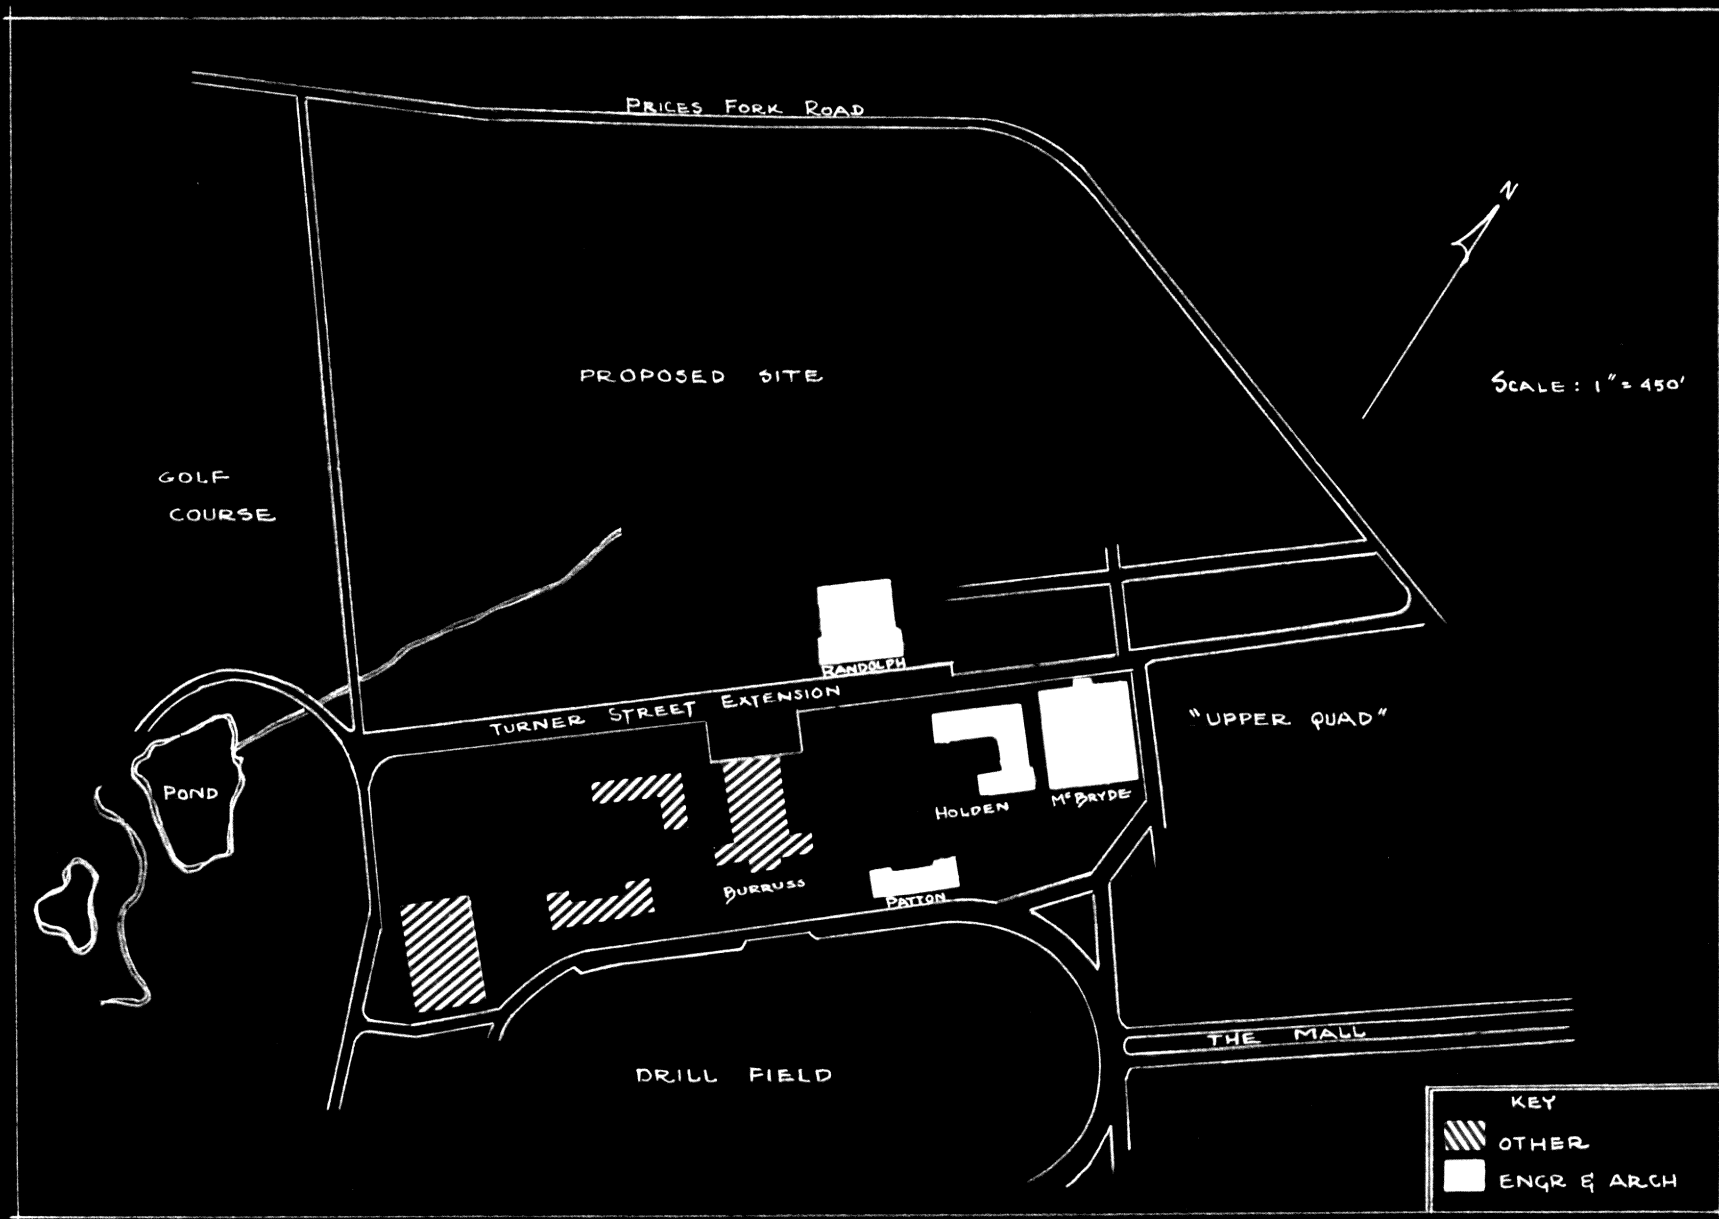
Plan Showing Relationship of Site to Existing Buildings on Campus.
